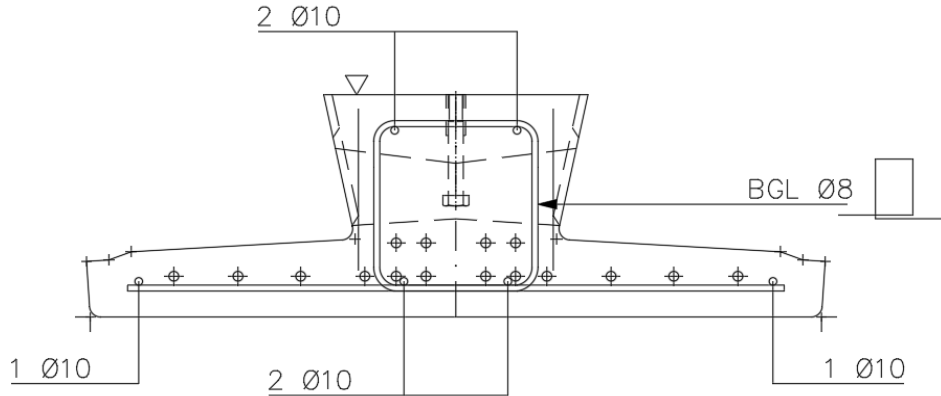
Longitudinal rebar and stirrup locations in the girder cross section
